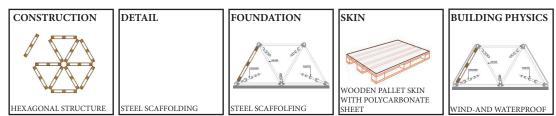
Temporary Hexa structure. Fig 17. Connection, detail, foundation, skin and building physics method. (Own image) Source: (Starr. B, 2013)
